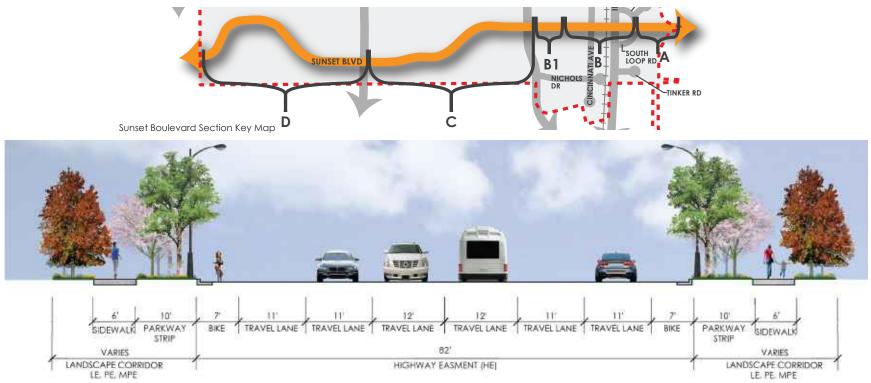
Sunset Boulevard-Section B, 6-Lane Arterial - no median through bridge (S. Loop Road to Placer Ranch Entry)
